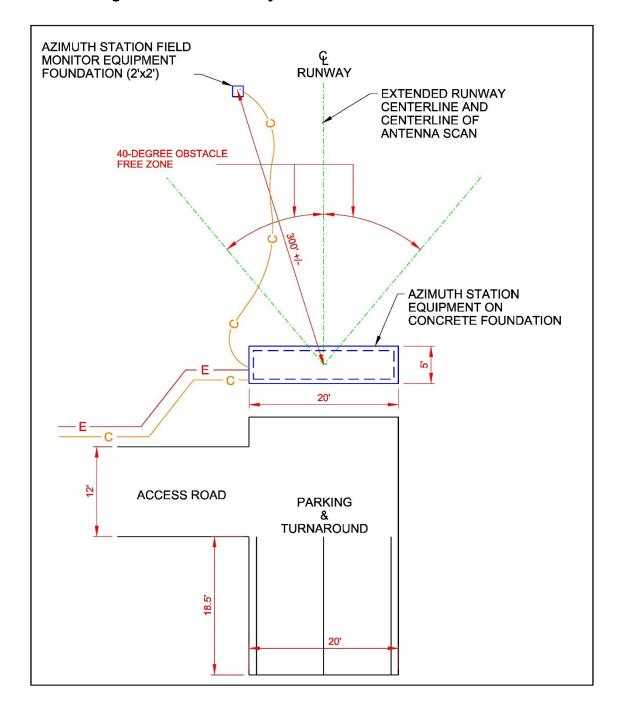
MLS Facility: Azimuth Station Site Plan
